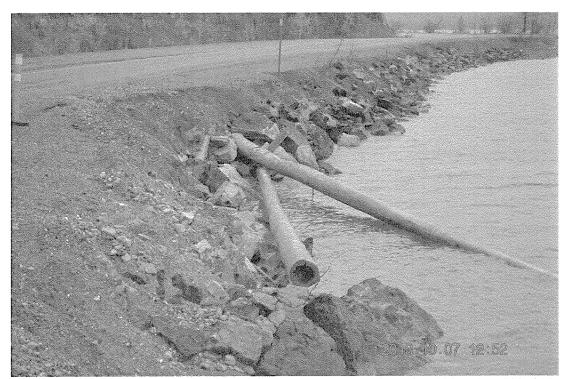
Looking South at Existing Riprap and Logs between Stn. 703+082 to Stn. 703+097.
